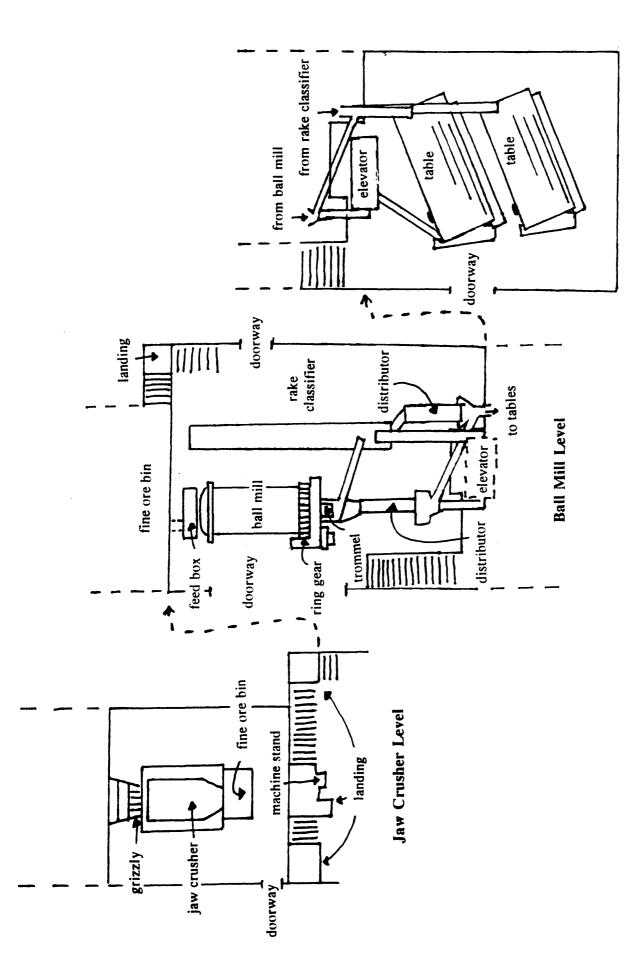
Rough schematic floor plan of Gold Point Mill (Not to scale)
